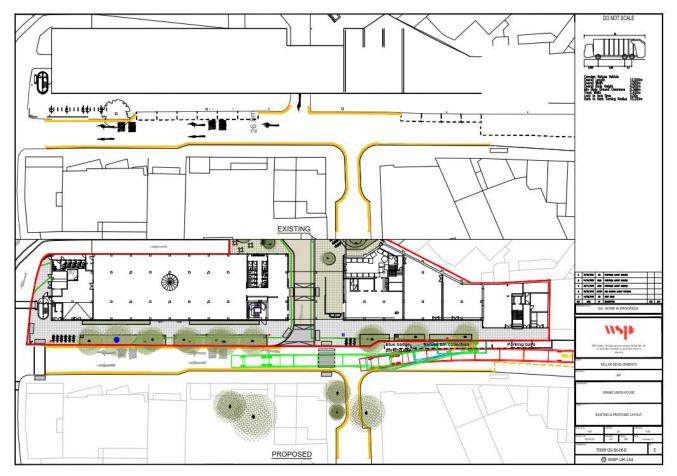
Existing and Proposed On-Street Parking Configuration
